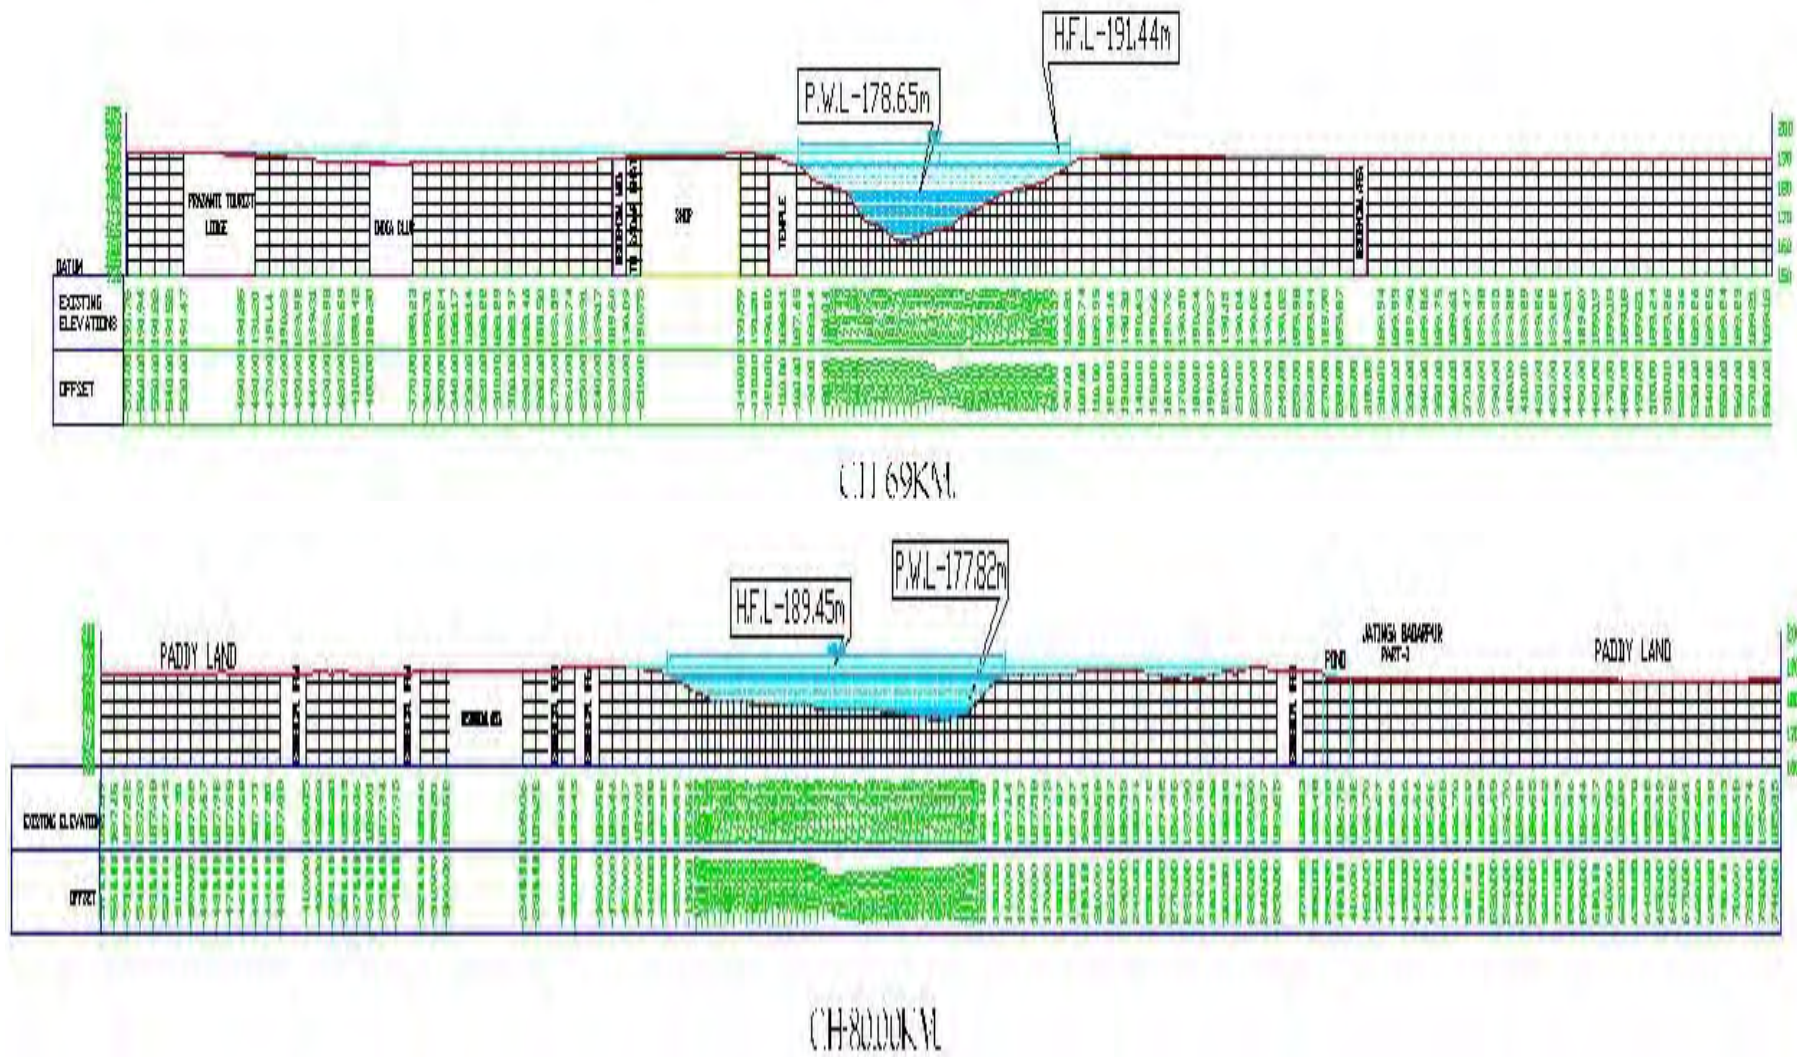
(d) Section Details of Barak River upto 500m in the countryside
